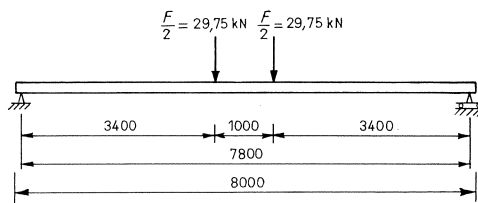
Loading arrangement on the test beams T 40/70. (dimensions in mm).
